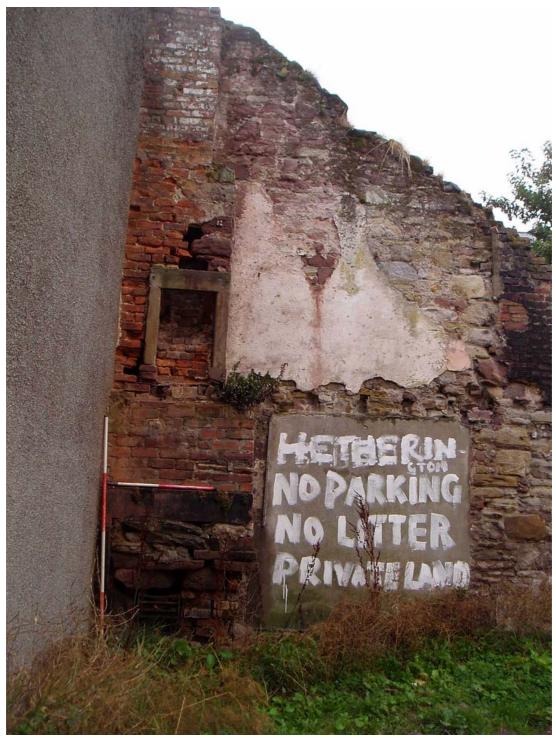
Photographic survey of west-facing elevation of the property boundary wall
